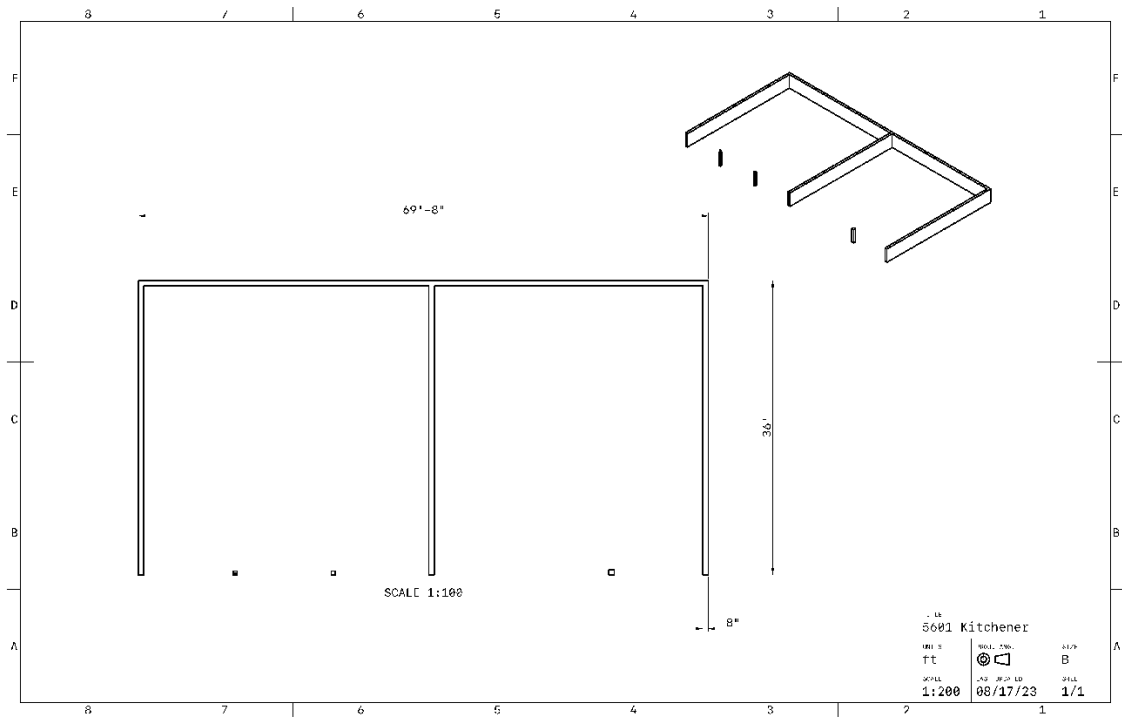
Building foundation plan showing the proposed building area of 234 m²
